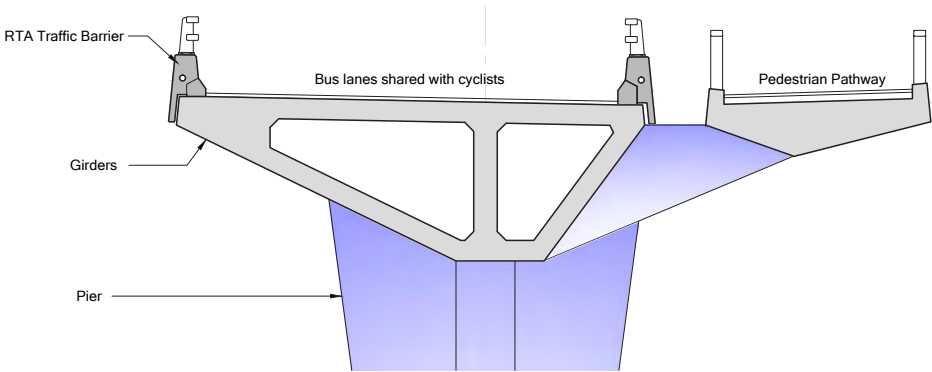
Option 5: Tapered soffit box girder bridge with skylight
